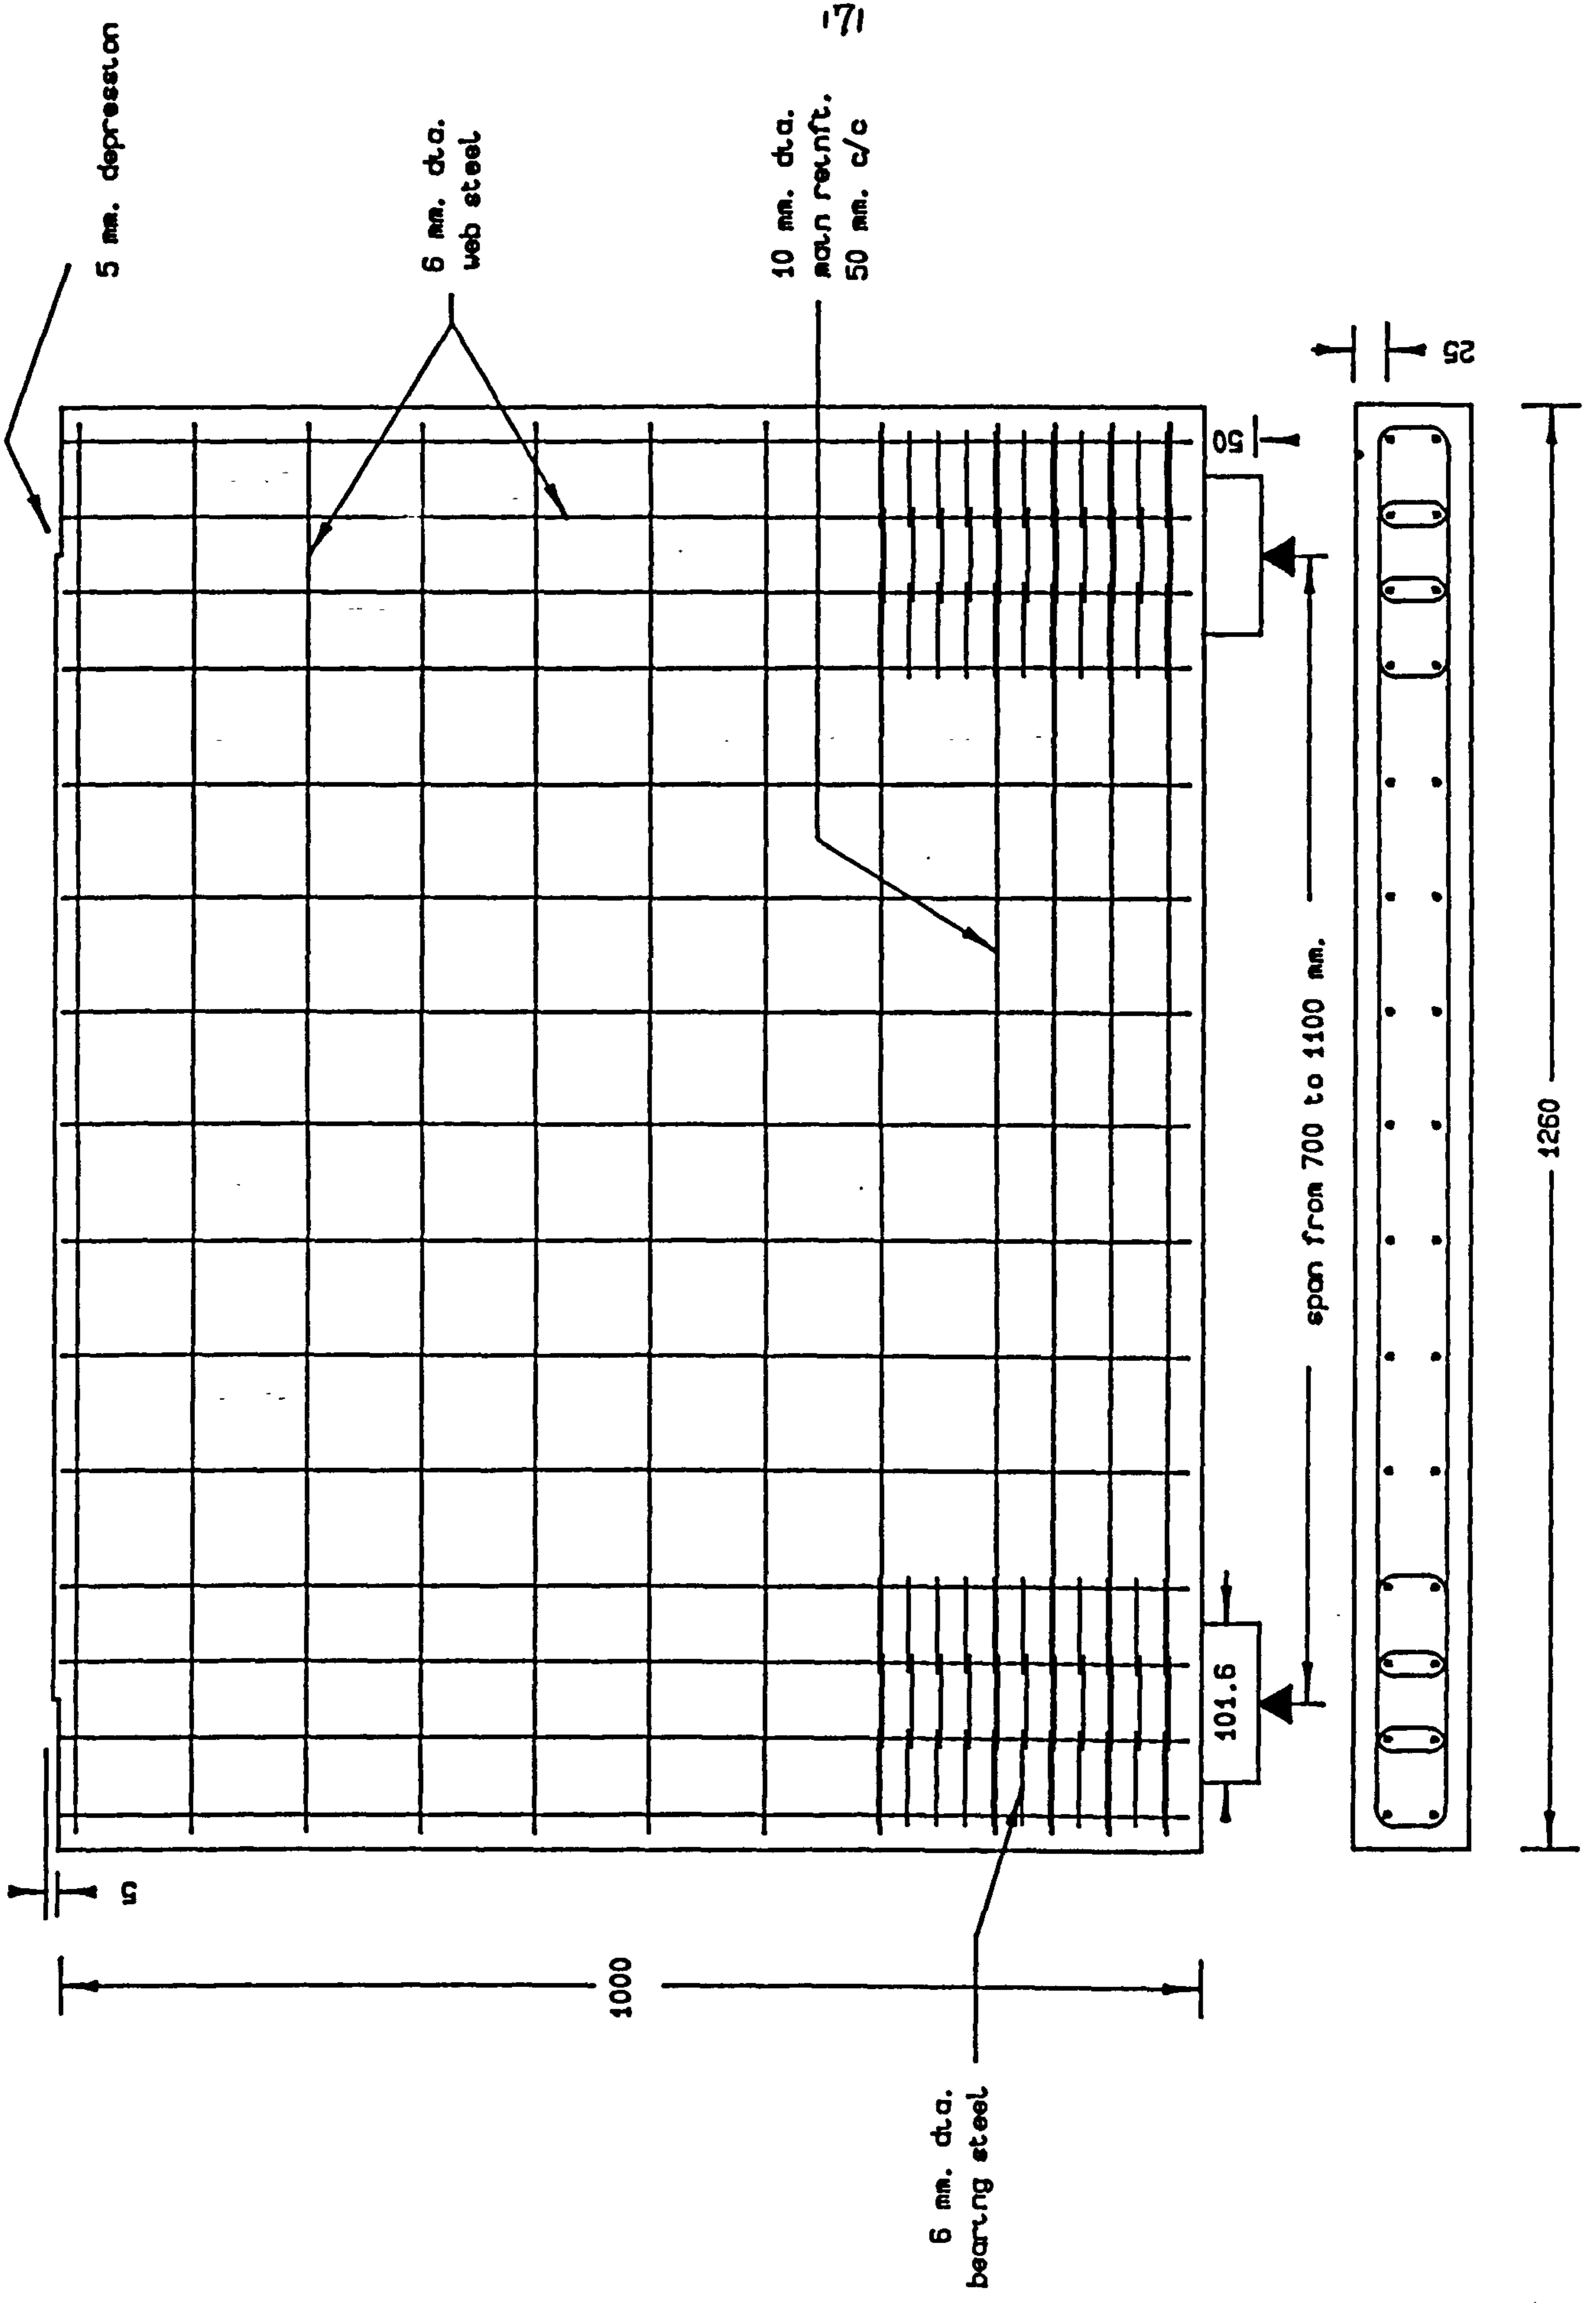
Geometric shape & reinforcement detail of test beams DB1 to DB6.
